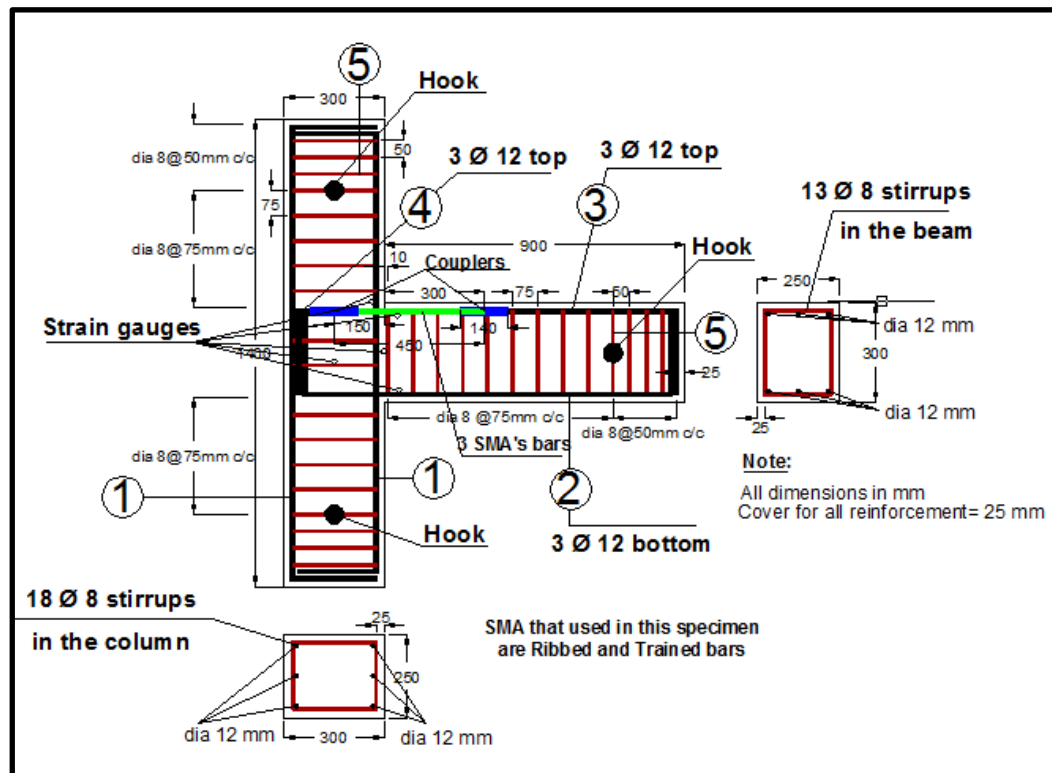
4: Geometry and reinforcement details of NiTi-BCJ-1 specimen
